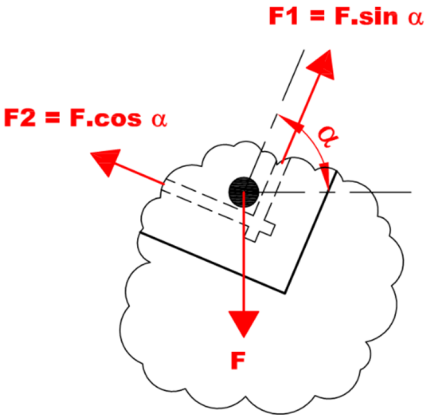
Cracked Concrete Cube Free Body Diagram for Burst Test
